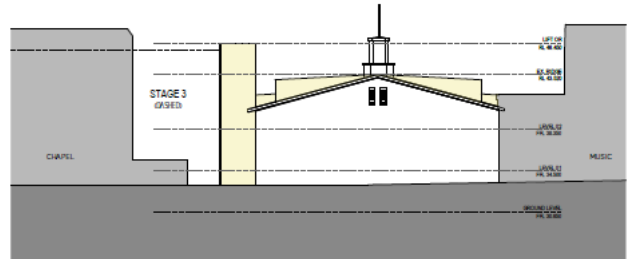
Proposed west elevation (massing only) of Centenary Hall).
